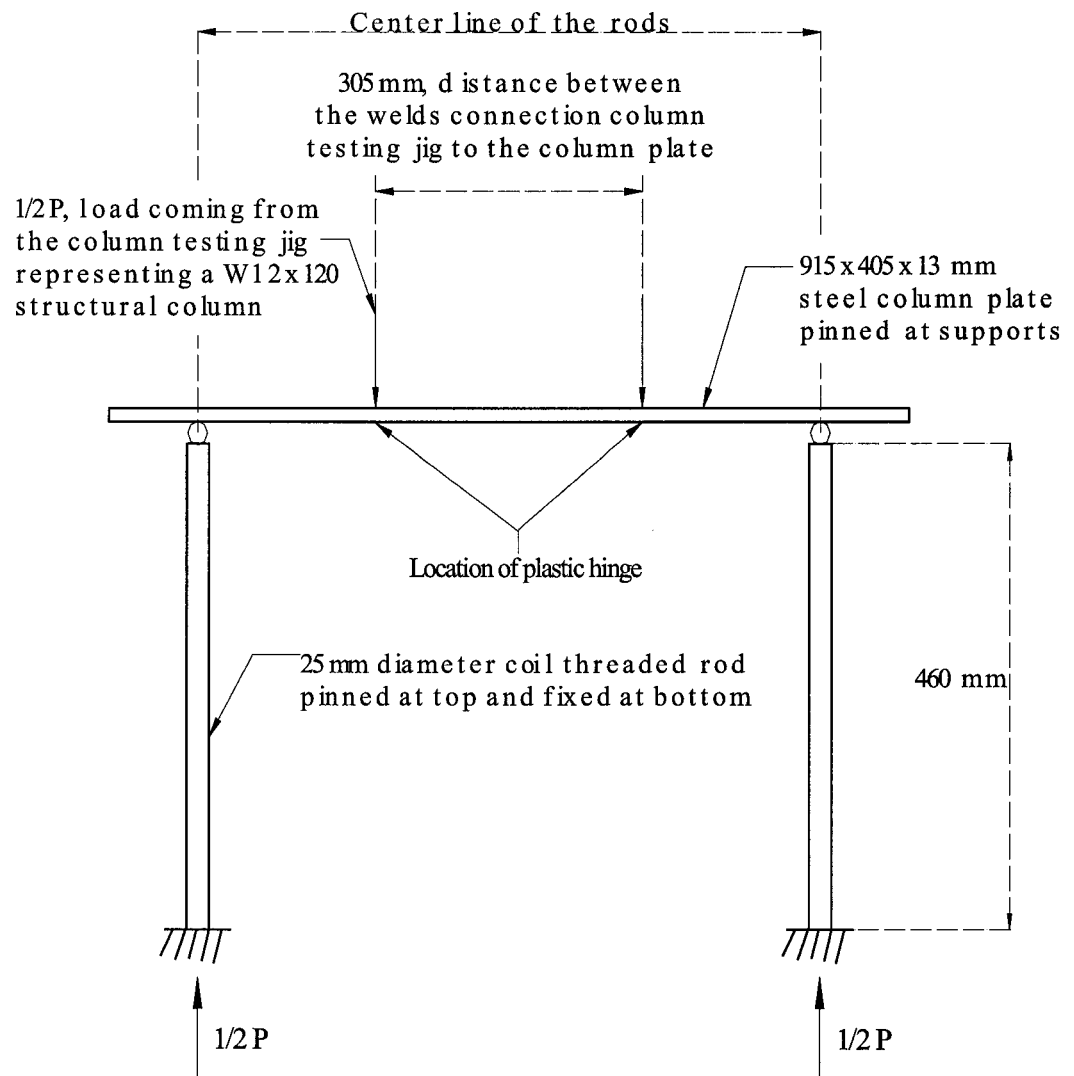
Testing Arrangement of Compression Test (PP4)
